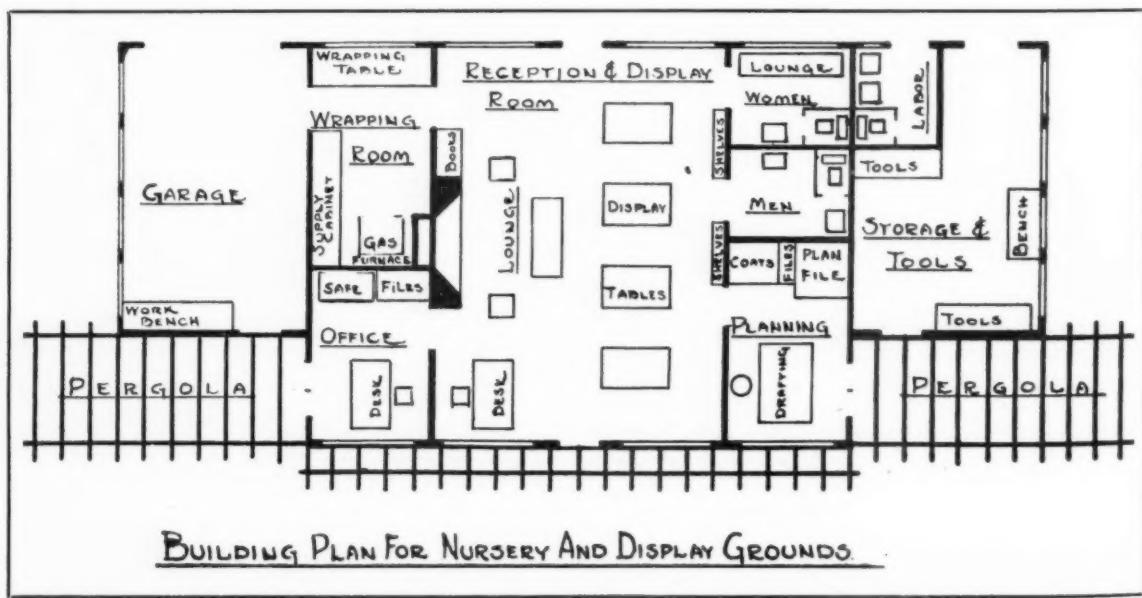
A floor plan detail showing the essentials in a sales grounds building. This was designed by Jan B. Vanderploeg, North Muskegon, Mich. Mr. Vanderploeg won an honorable mention on his plan.
